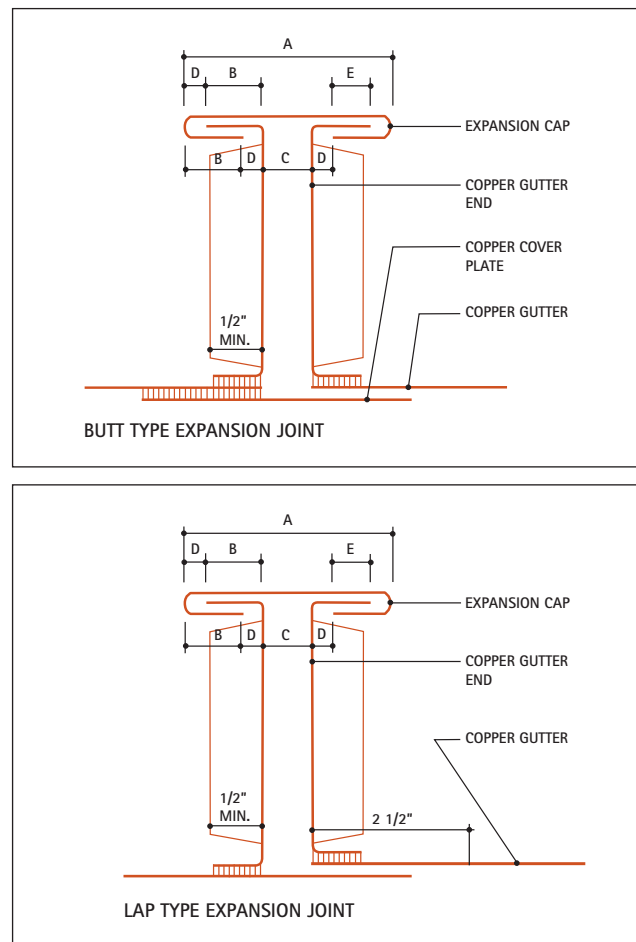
Typical fabrication details for butt- and lap-type expansion joints for copper gutters. Expansion joints are essential to accommodate thermal expansion and contraction. Consult the *Copper in Architecture Handbook* for detailed information on architectural sheet copper use.
